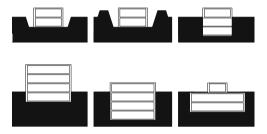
Underground building in superstructure style Top (from left to right): the excavation that remains open – with the spoil used to form an enclosing wall – excavation backfilled Bottom; toossible relationships between substructure and superstructure
